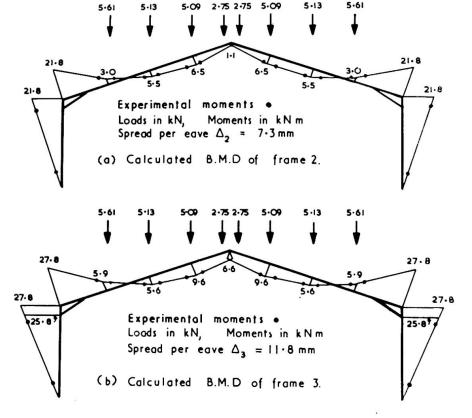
CALCULATED B.M.D OF SHEETED BUILDING
